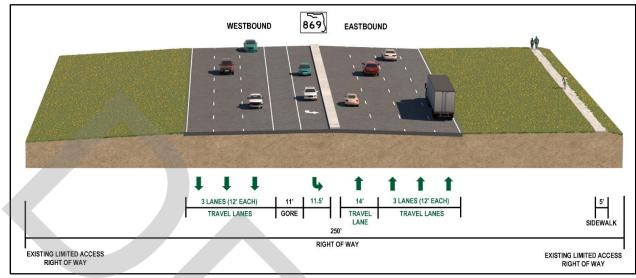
(c) - Existing Roadway Section of SR 869 between Lyons Road and Florida's Turnpike
